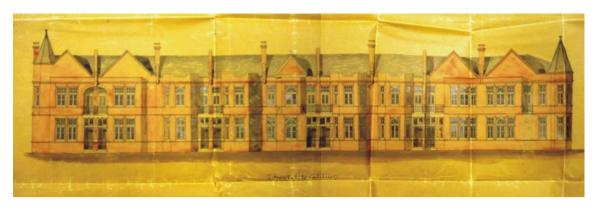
Houses in Halsmere Road, built by P. Arundell, designed by the architect & surveyor Ernest Avern (Ibid., IV/83/1/5/1/23).
